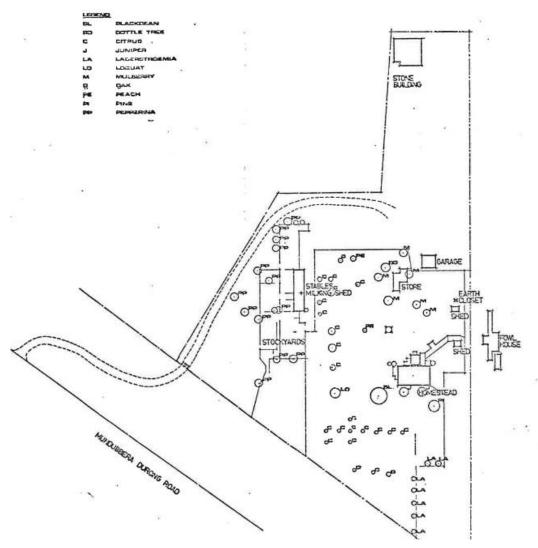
Extract of a 1982 site plan of Boondooma Homestead, prepared by Bruce Buchanan Architects, illustrating the significant vegetation and plantings surviving on the property. *Source*: Bruce Buchanan and Associates (1982).
